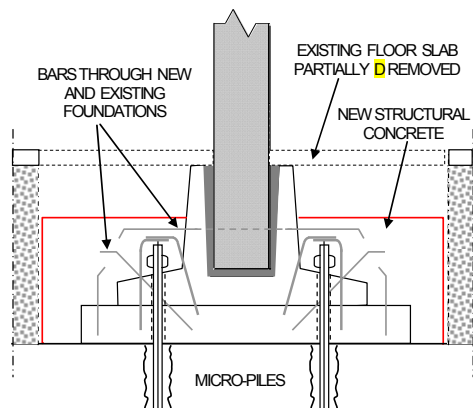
Existing foundation improvement with additional piling and a new footing surrounded to it.
